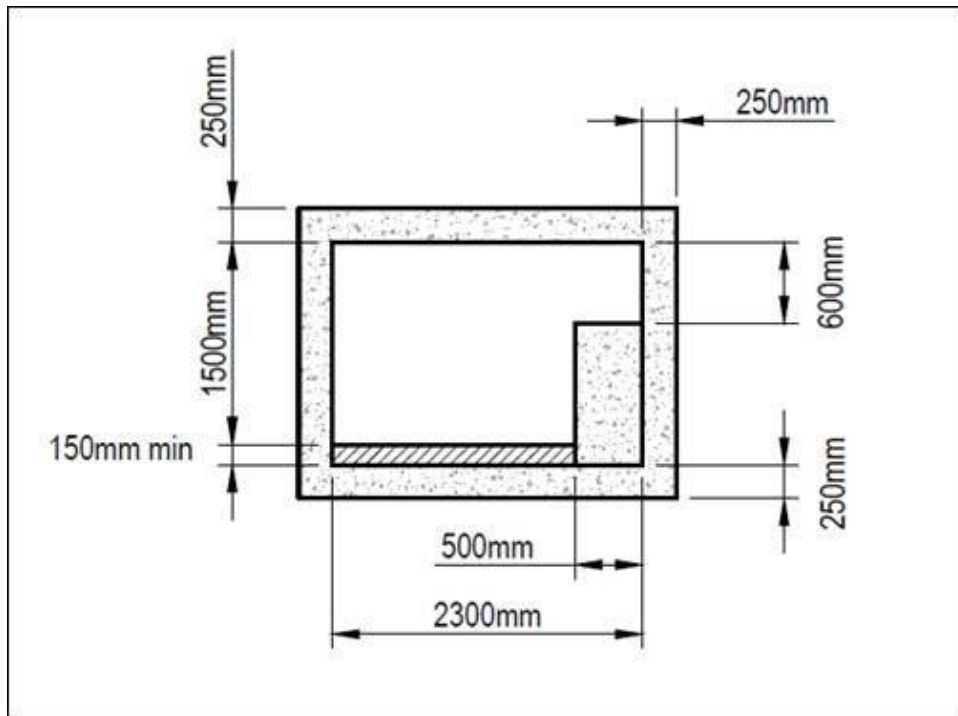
Top Farm Brook Proposed A428 Culvert (dimensions not to scale)
